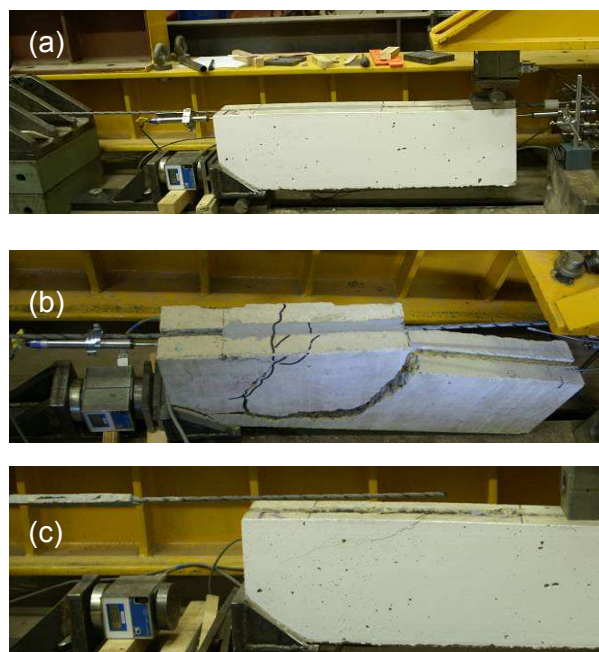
Preliminary tests: (a) test set-up, (b) flexural failure of concrete in tension and (c) resin-concrete interface failure
